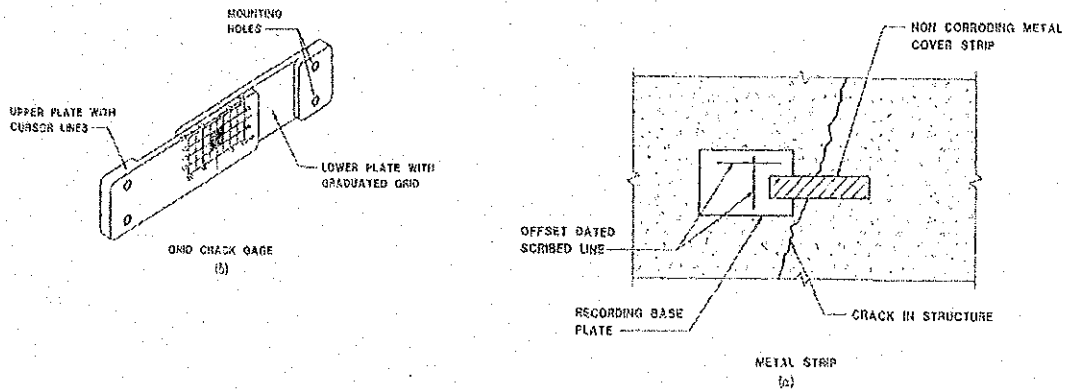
Manual Crack Gauge (a) Grid Crack Gauge, (b) Metal Strip
